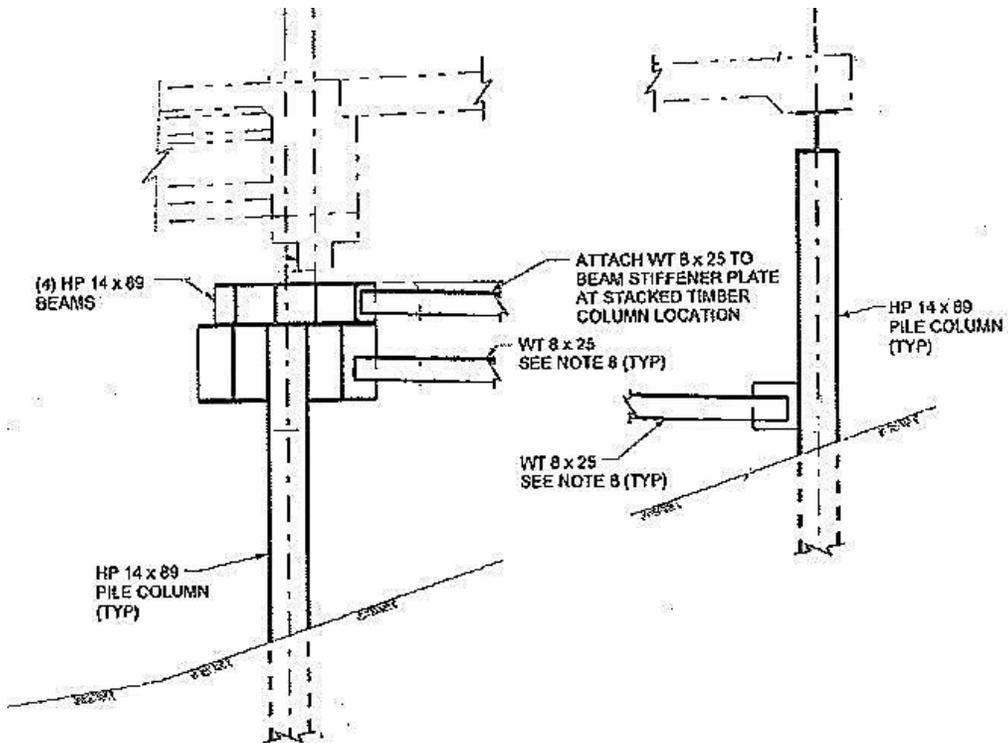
End view of the I-80 over 2300 East, EB bridge temporary substructure at the abutment and the end of approach with lateral bracing
